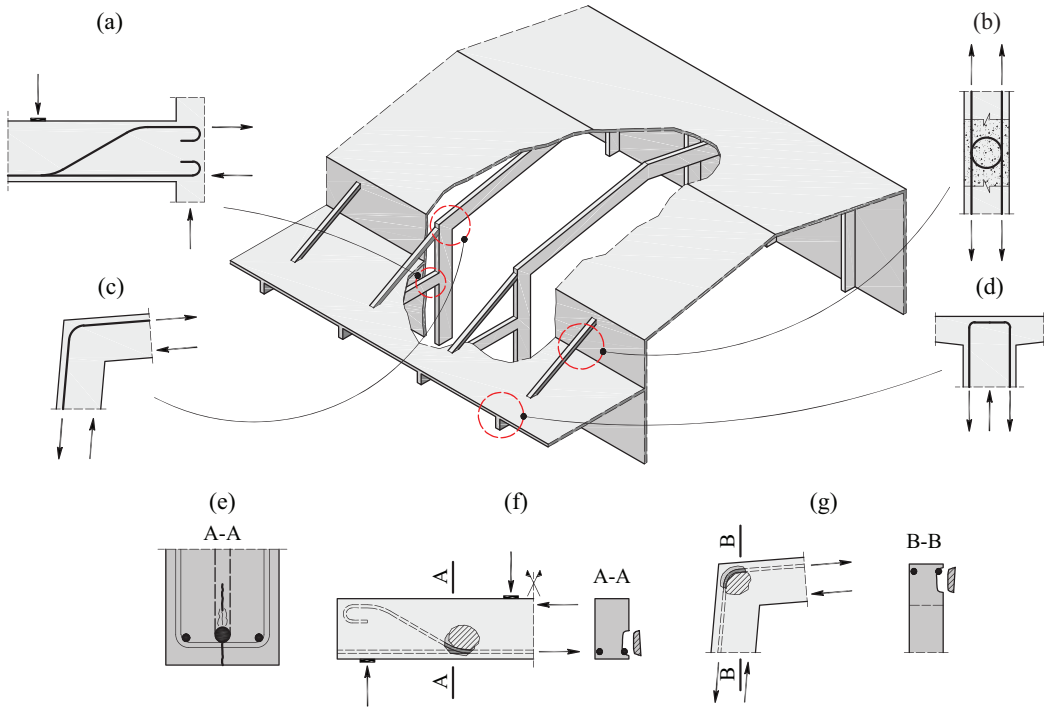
Applications of bent bars (a)-(d) and type of concrete failures (e)-(g): (a) beams; (b) joints; (c) corners; (d) stirrups; (e) splitting cracks with local concrete crushing in case of large cover; and (f)-(g) spalling of concrete cover.
